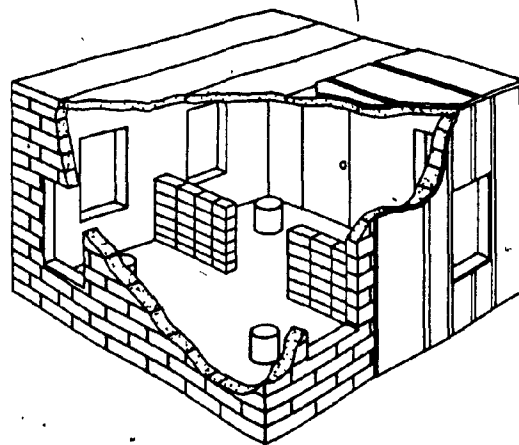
The Experimental Building Showing Windows, Internal Mass, and Insulation on the Outside of the Building.
